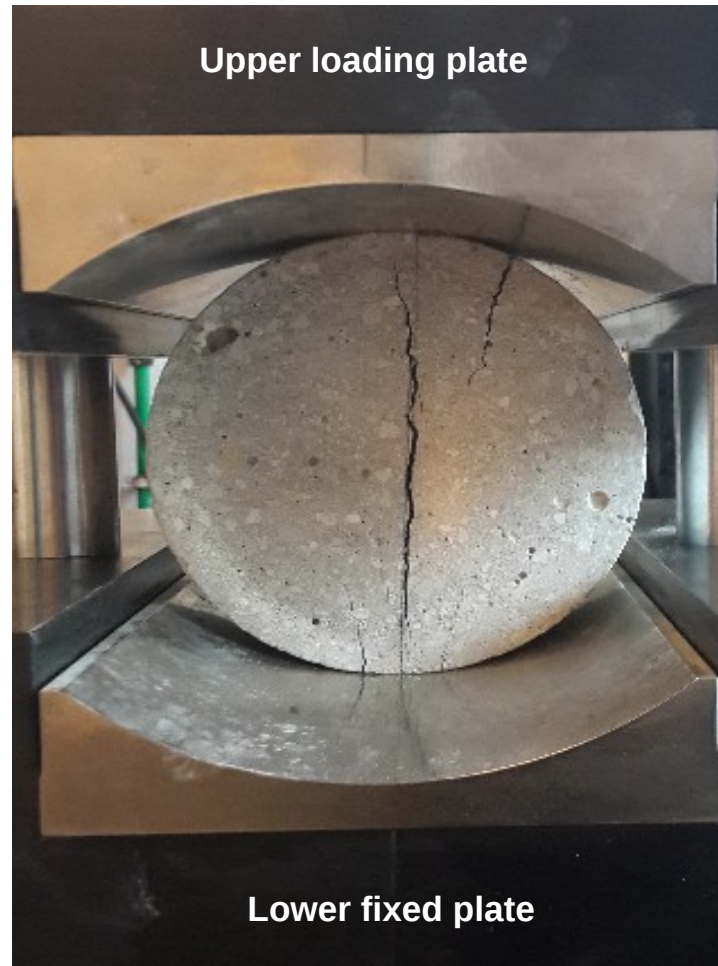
Cylinder specimen under loading in the MTS machine.
